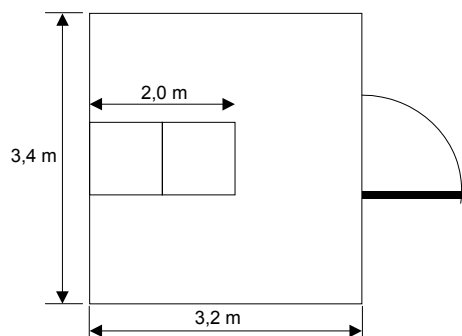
Minimum room dimensions to support distributors containing up to 500 outlets
